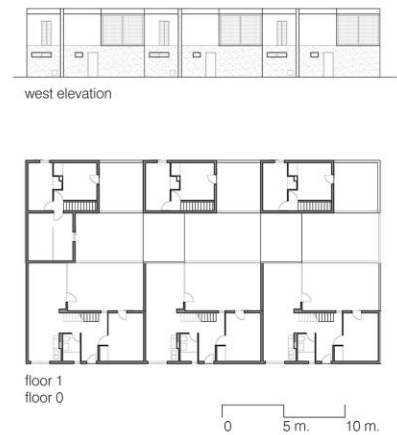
Caño Roto Housing Estate. Plans and elevations of the building typologies after rehabilitation. (Source: Drawing by the author).
